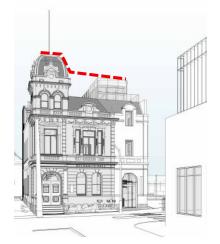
Extract of drawing A3-800 from updated HV02 set. Render view of the building's proposed west (front) façade from Carlton Street. The height of the new upper level does not exceed that of the tower (indicated with red dashed line), allowing the tower to remain visually dominant. Source: Trethowan Architecture, 2025.
